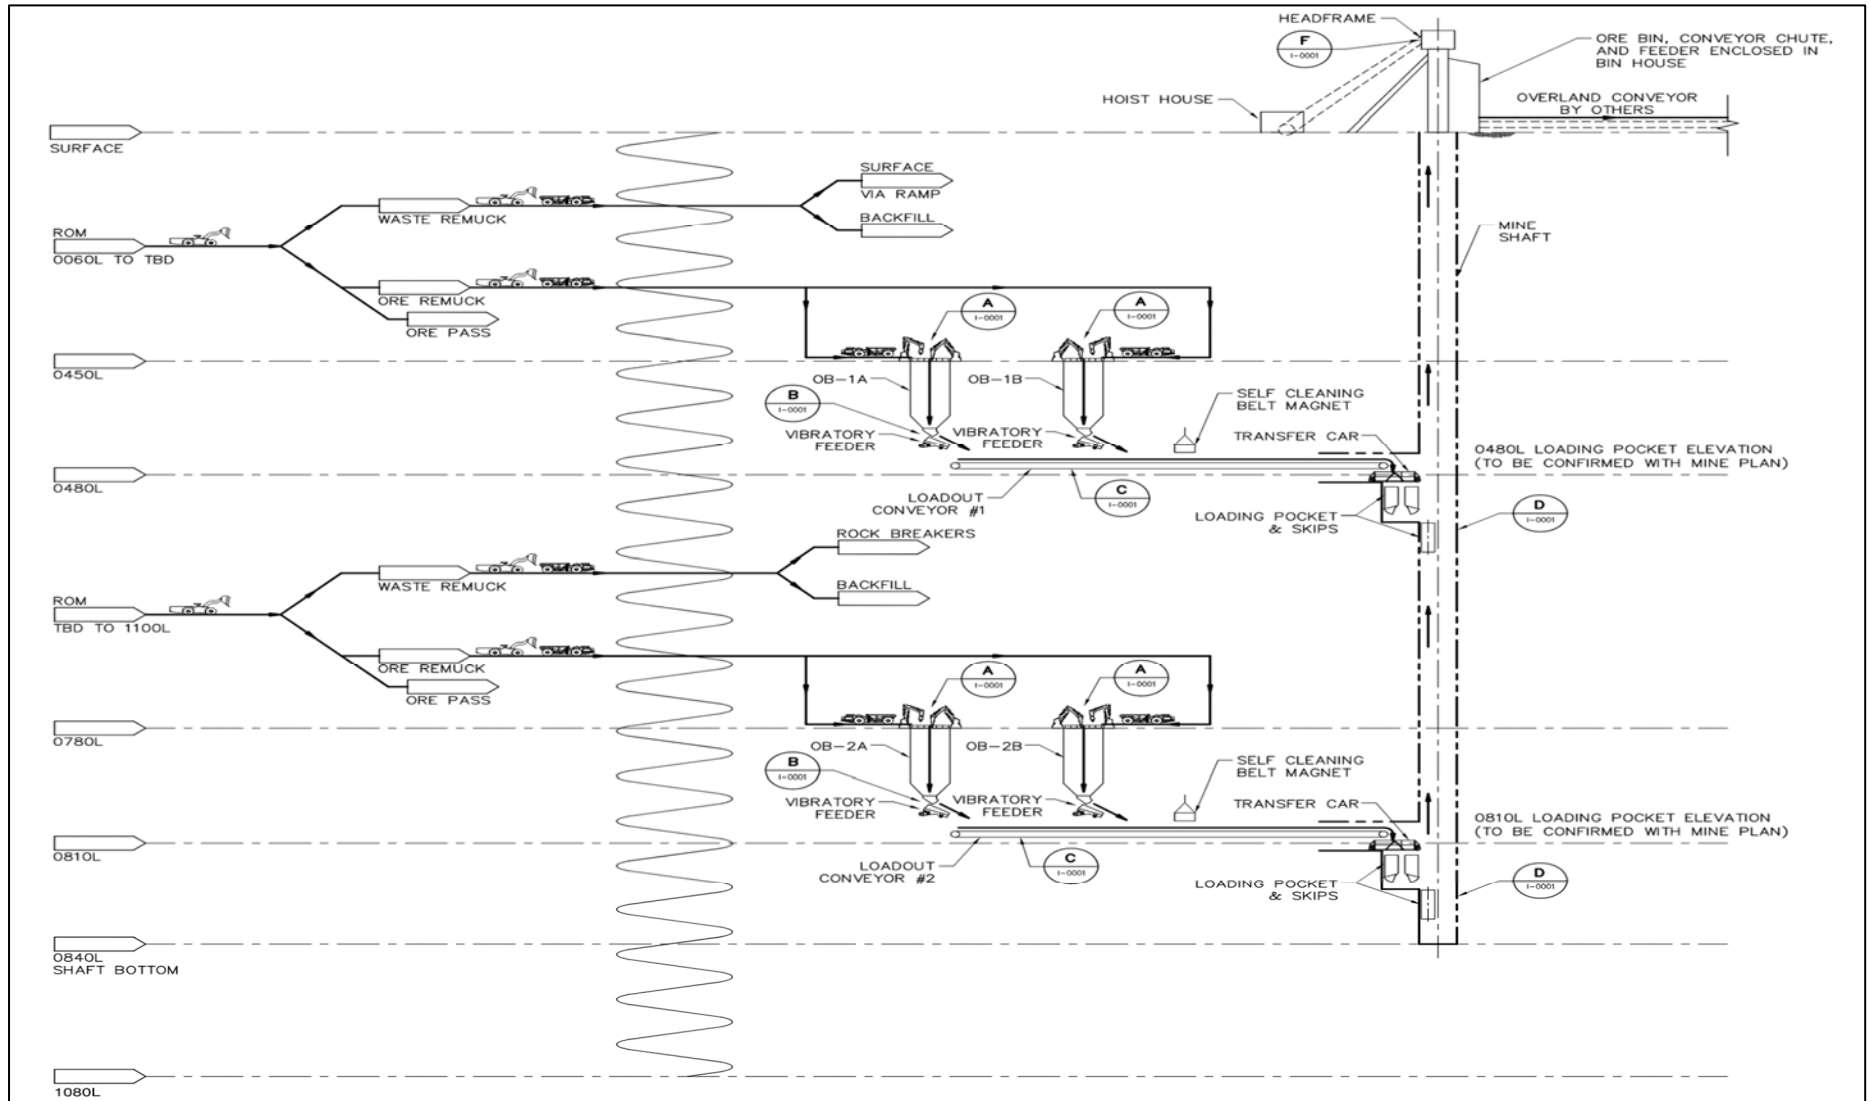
Proposed Ore and Waste Rock Handling System Schematic
